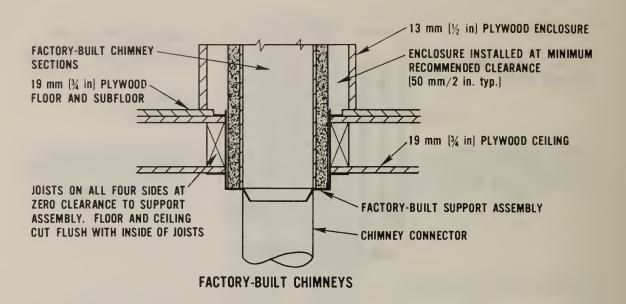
Details of the Construction of the Factory-Built Chimneys Tested.
